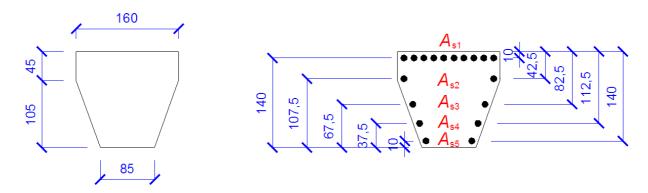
Shape and location of the reinforcements of the full section of the cantilevers (annotations in cm)
